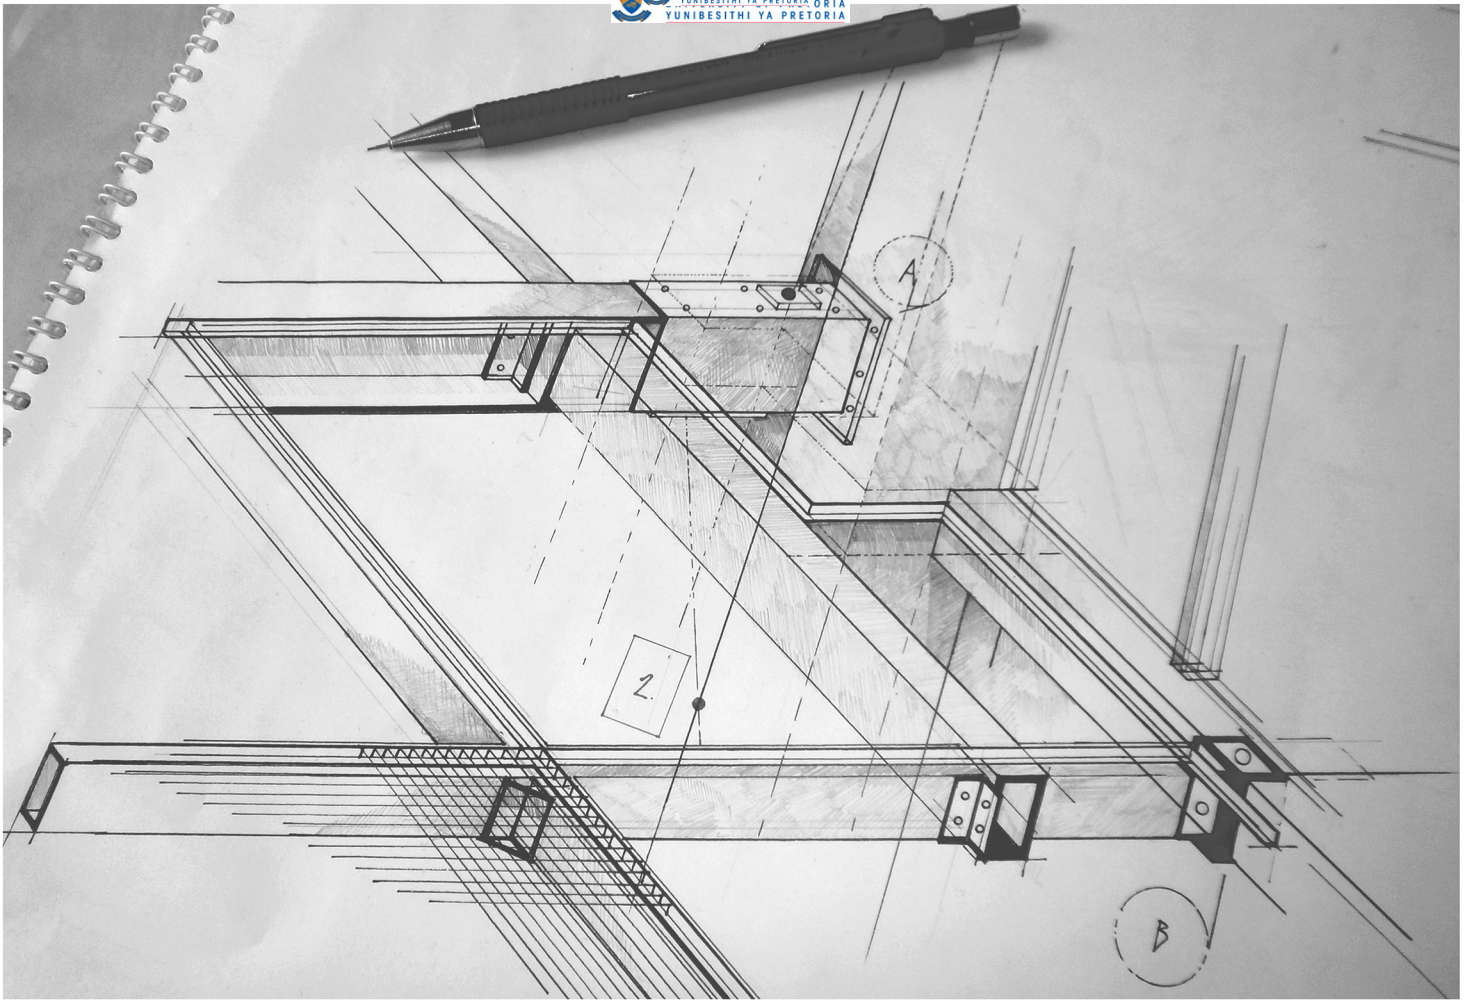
Exploration of detailing | mentis grid walkway | beam to VWL column connection | beam to beam connection
